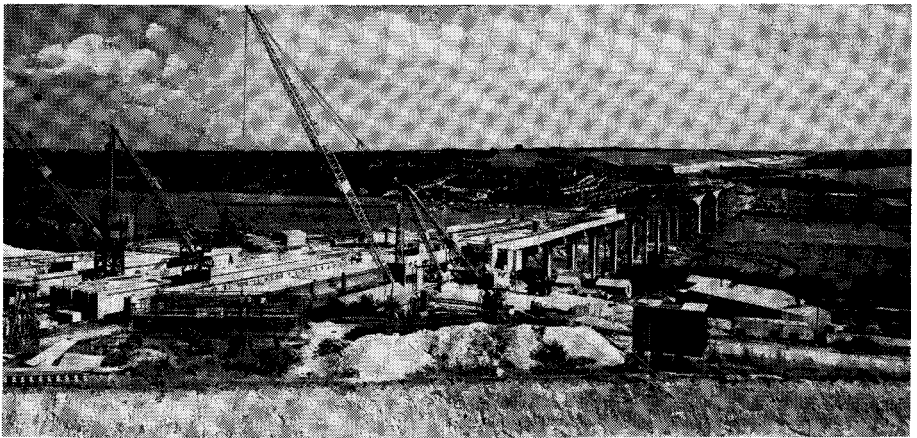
Construction Shot of the Casting Yard and the Entire Bridge Under Construction.
